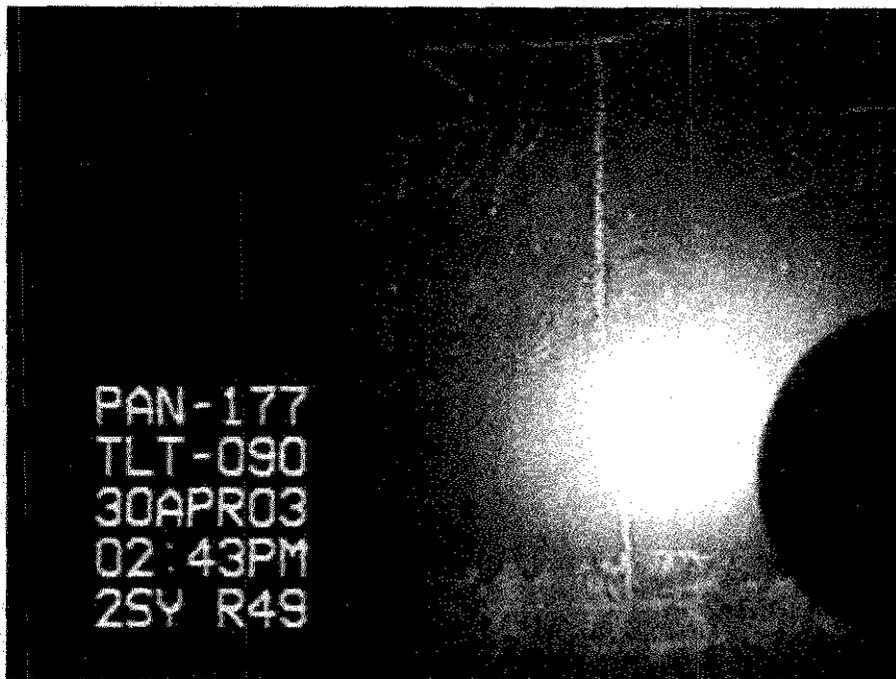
SY-102 Riser 49, Primary Tank, Horizontal Weld/Construction Marks (2003)
